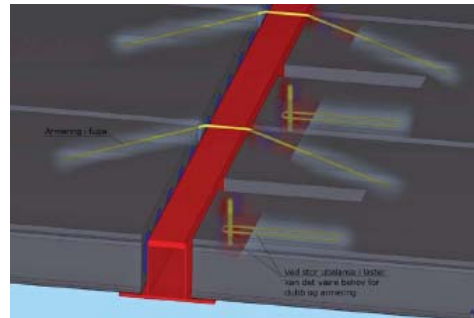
Principle connection of deck elements to two sided HSQ beam.
